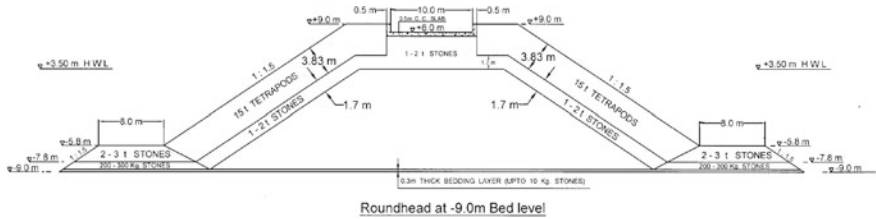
Design cross-section of breakwater for roundhead at -9.00 m bed level
